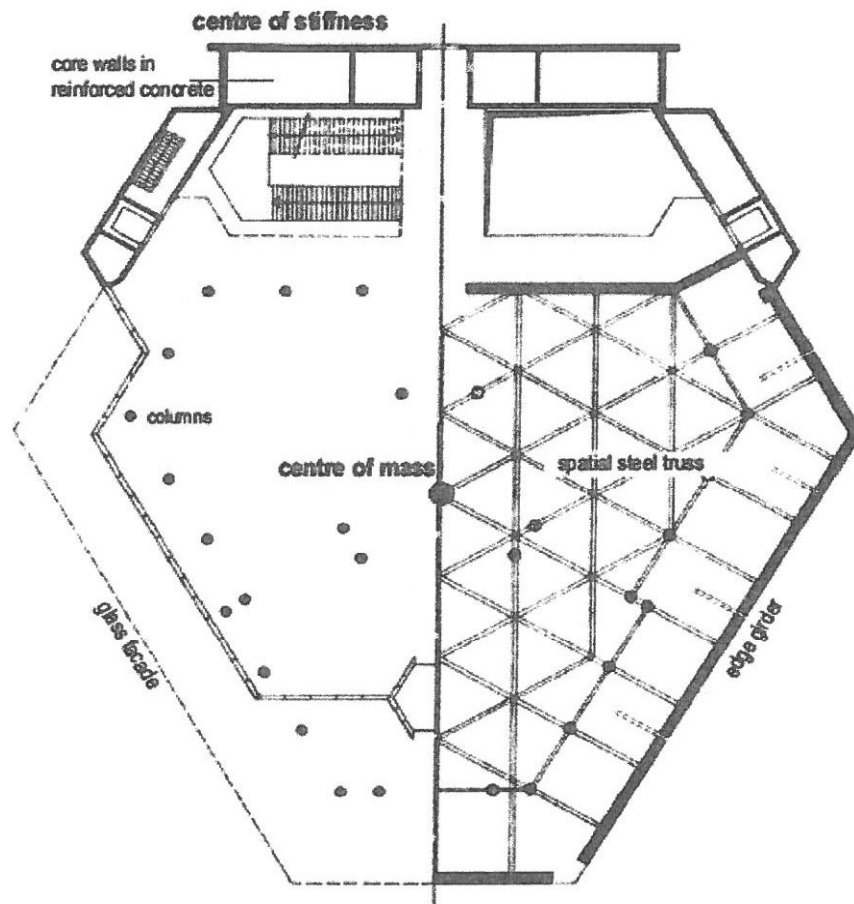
(a) Floor plan of an auditorium through the ground floor level (left) and through the hollow space of the support floor (right) with the locations of the centres of mass and stiffness
